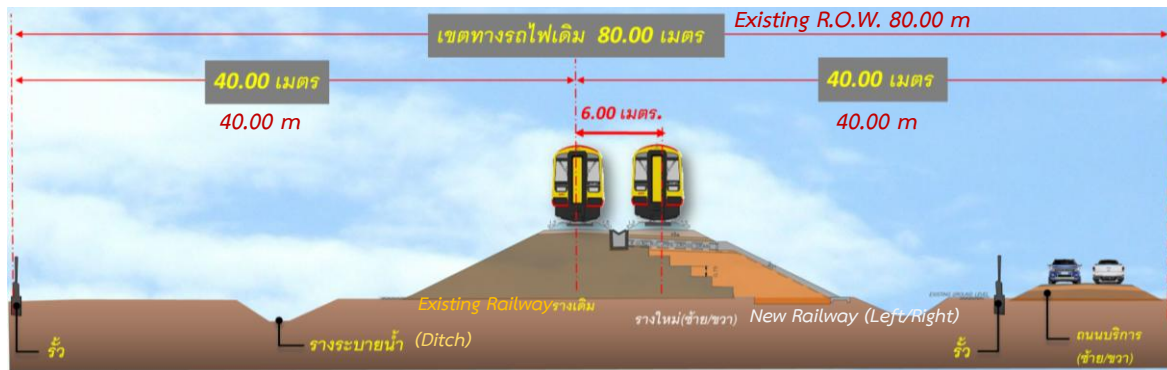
Typical cross section of Surat Thani-Hat Yai Junction
